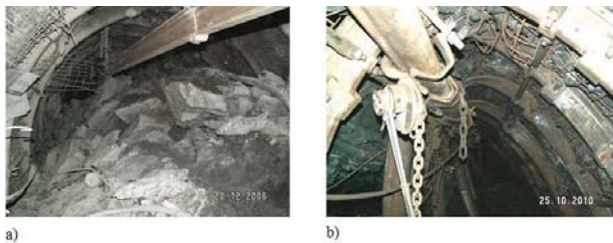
Damaged mine workings after rockbursts. (a) Strong floor heave in the working, (b) deformation of steel arches
